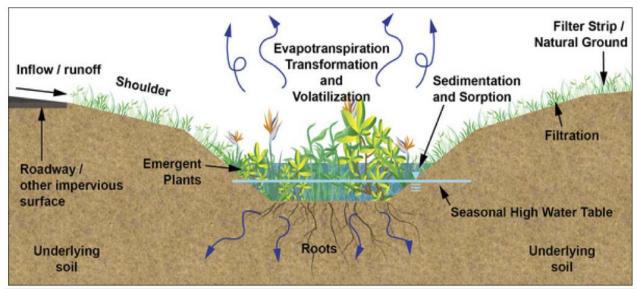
Typical wet swale cross section and stormwater treatment process (Ekka & Hunt, 2020)
